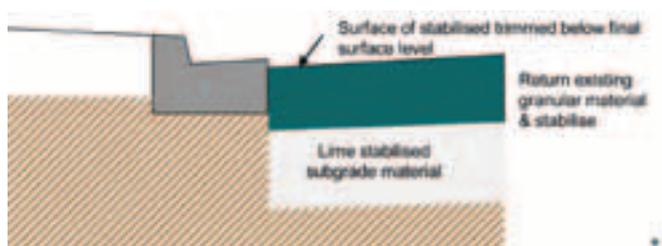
Sub-grade stabilisation with existing kerb and gutter.
